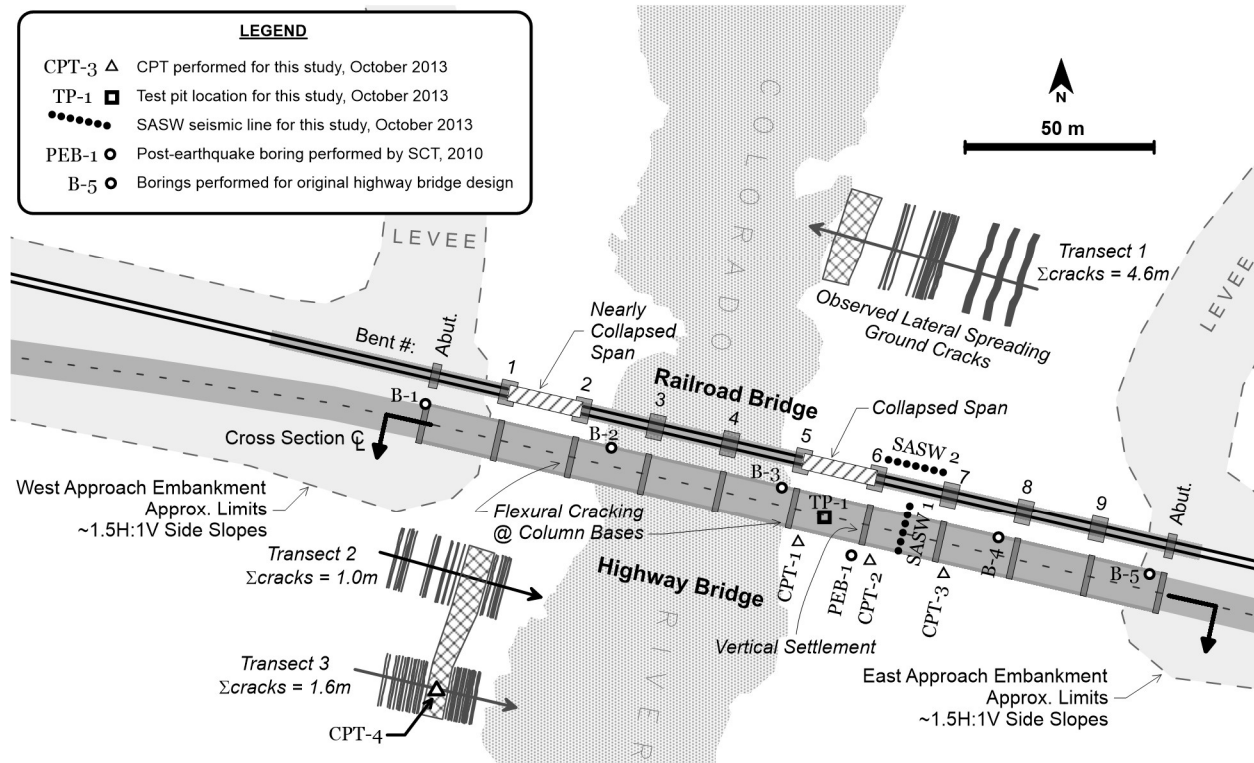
Site plan showing observed damage and locations of subsurface explorations. Ground failure after GEER (2010).
